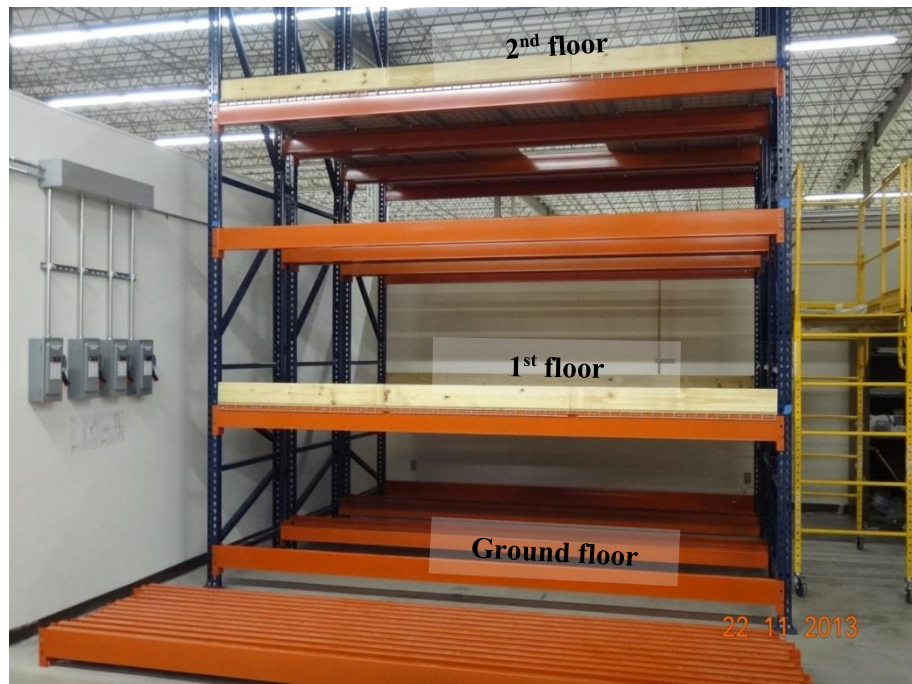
Pallet racks structure for the TAMU Air-Cooled RCCS. The structure is divided into three floors; namely ground floor, 1st floor, and 2nd floor.
